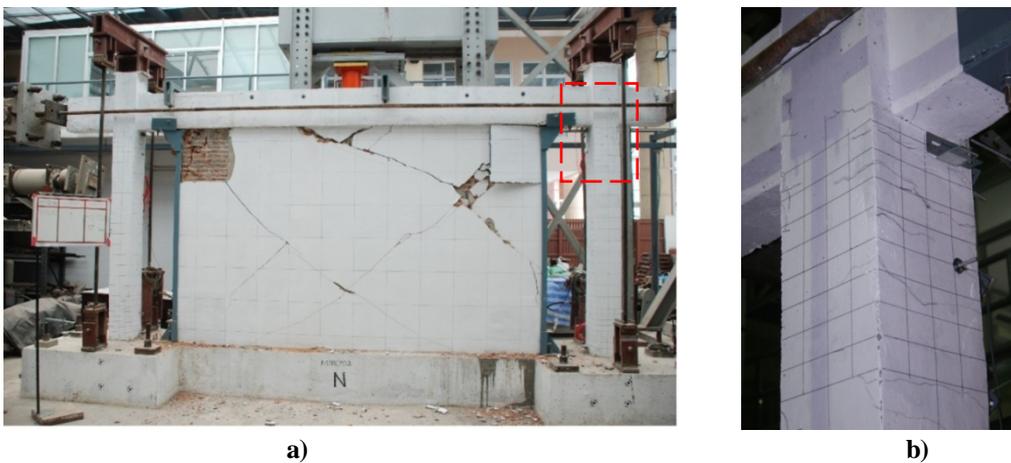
a) Retrofitted masonry-infilled RC frame (MIRCFO2) with the innovative scheme at 2% drift;
